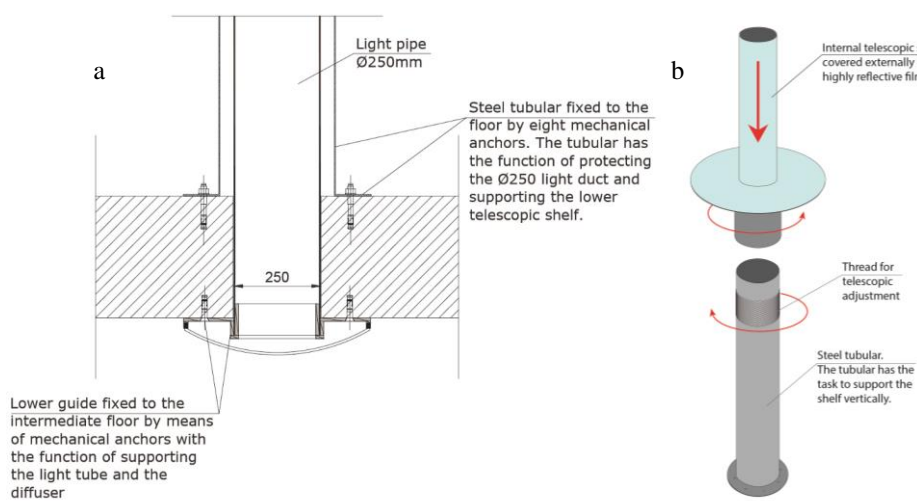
Fixing mode of the system to the inter-floor slab (a) and lower telescopic shelf (b)
